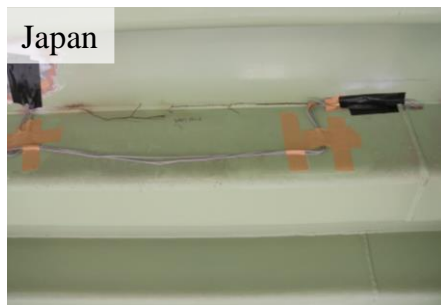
Fatigue cracks of steel bridge in Japan [18]
